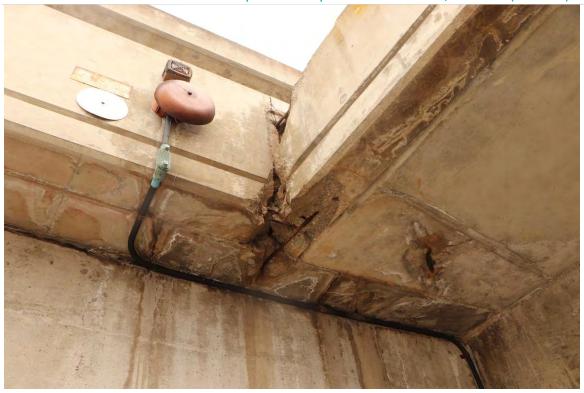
Soffit slab deterioration and spalls with exposed reinforcement, Pier level (BA1-327)
